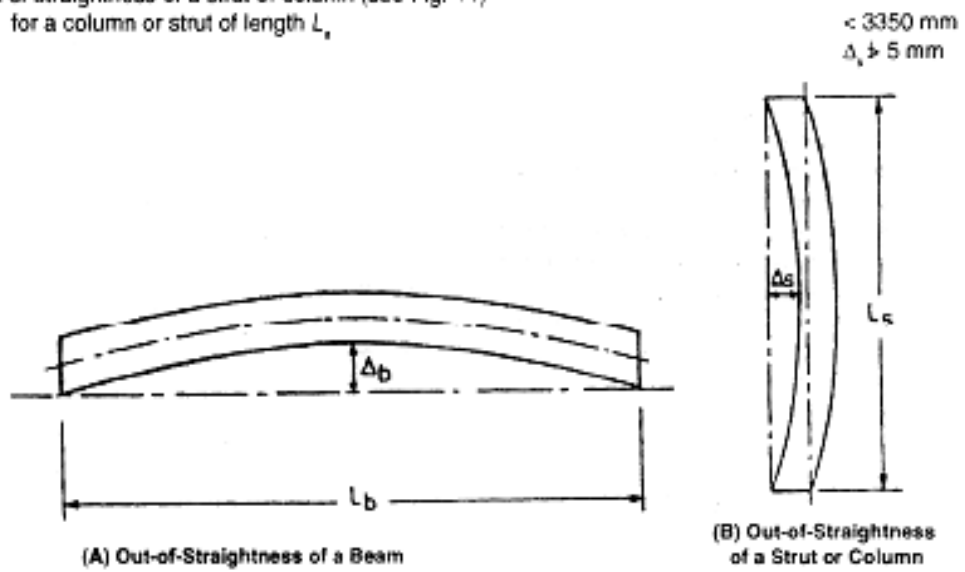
Points of Measurement of Tolerances for Purposely Fabricated Steel Work
